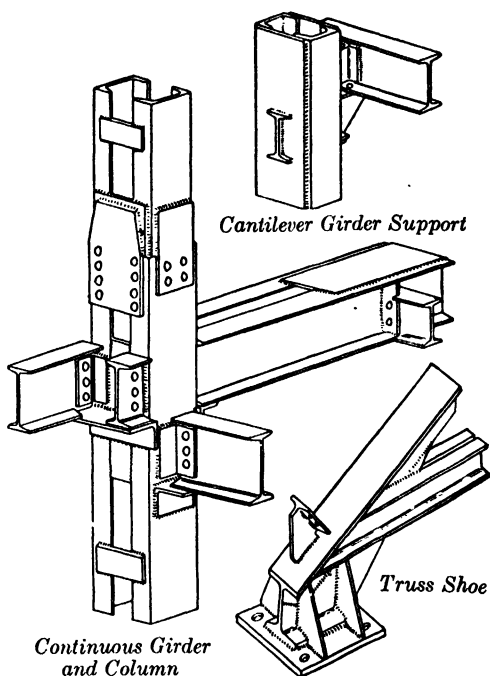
COMPLEXITY OF GIRDER-TO-COLUMN DETAILS.
